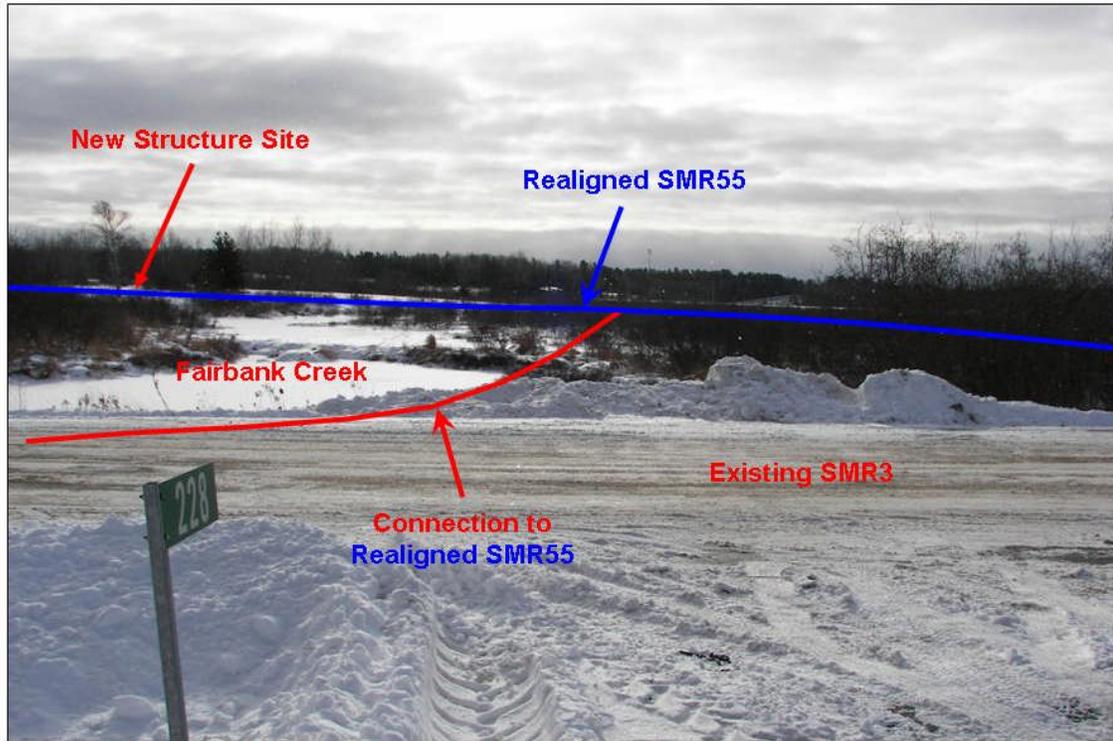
VIEW: Looking southwest from north shoulder of existing SMR55 at new connection from the Realigned SMR55 to the existing SMR55. (Dec. 6, 2007)
